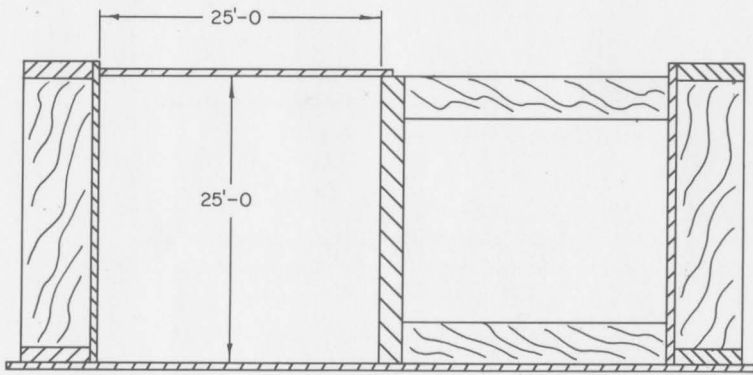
Plan view of Eagle Mountain Dam revised spillway model.
